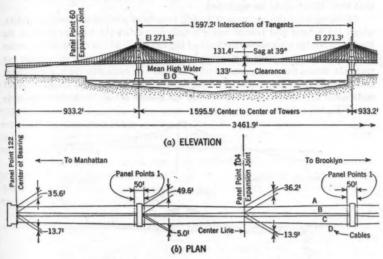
General Plan and Elevation, the Brooklyn Bridge
